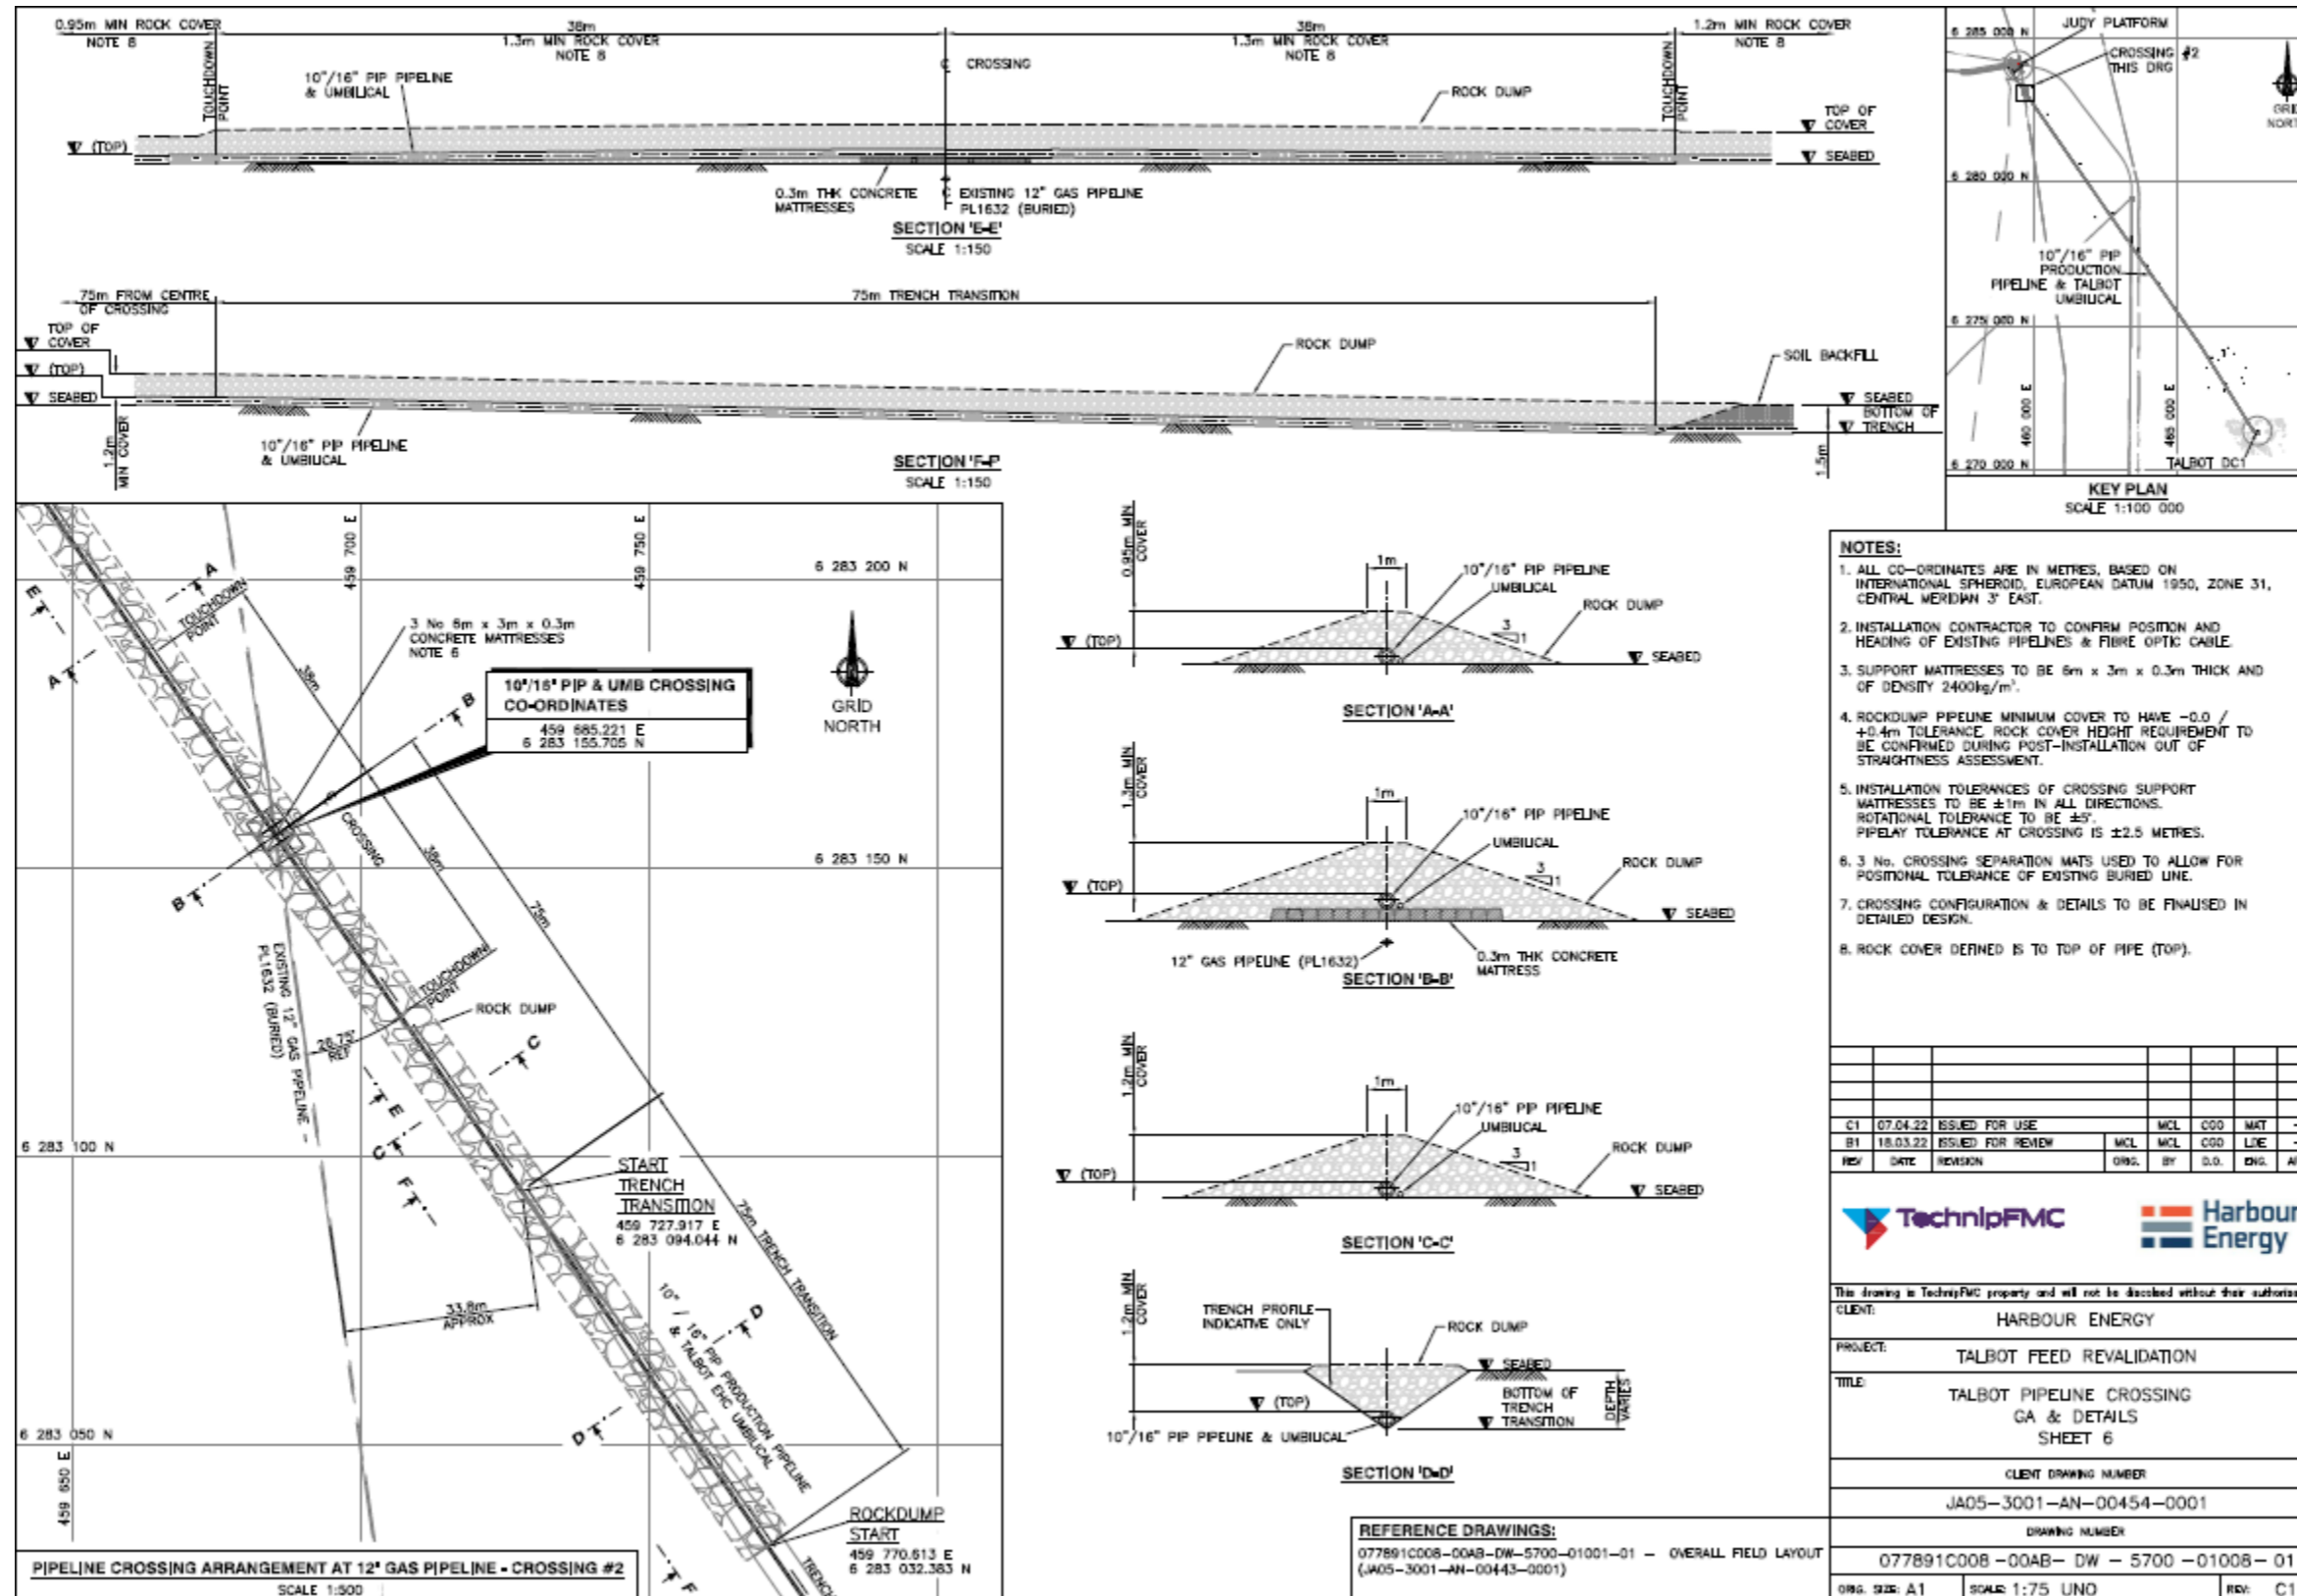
Schematic of Crossing Point 2 showing location of rock placement and mattress protection
